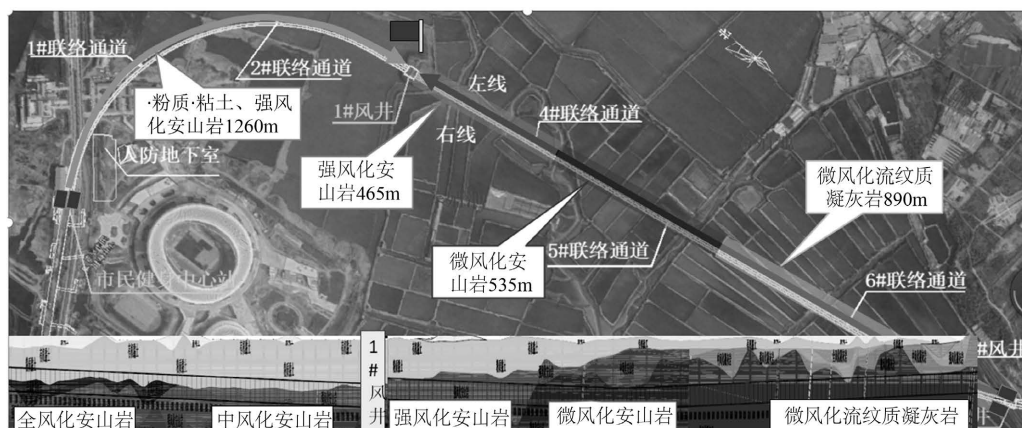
Layout plan of tunnel between citizen fitness center station and Guantao station
